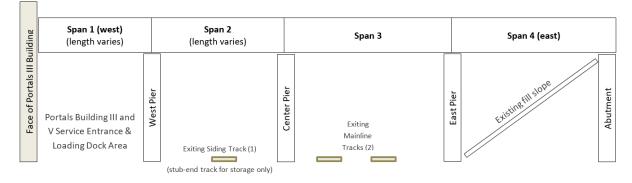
| Existing Maryland Avenue Bridge (looking north)
